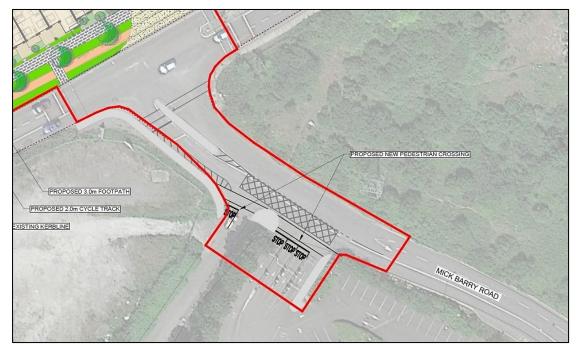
Proposed new pedestrian crossings on the Mick Barry Road. (Credit: Arup, 2022).
